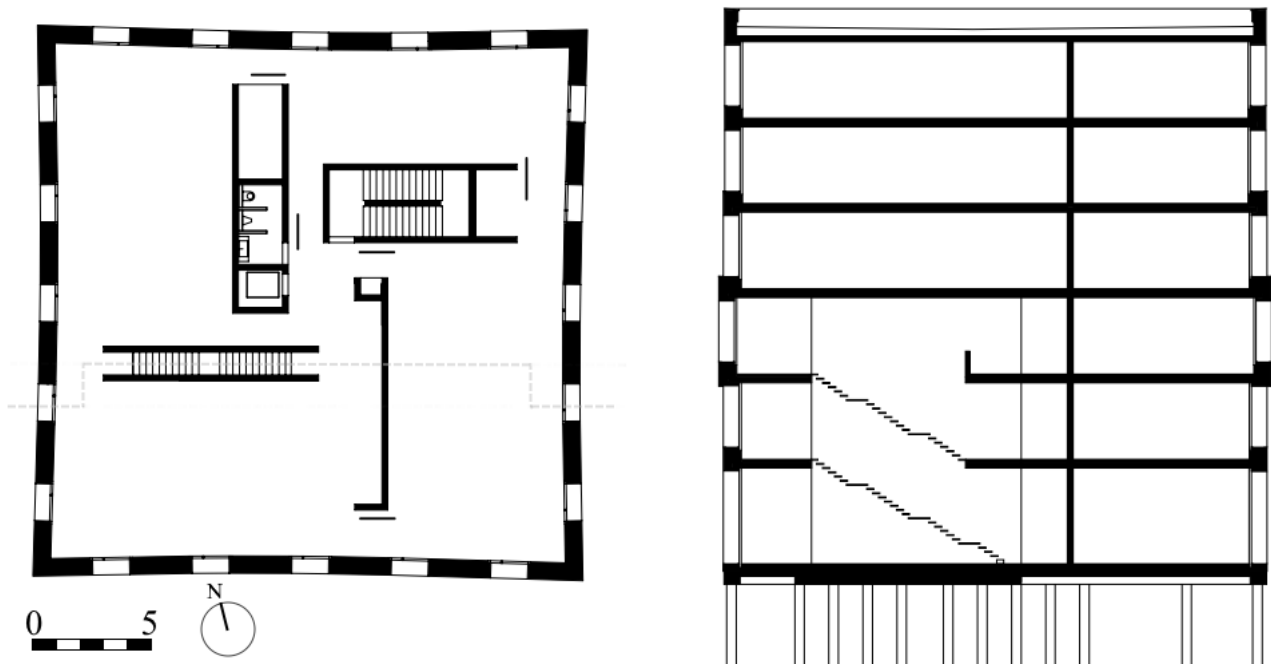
Typical floor plan (left) and vertical section (right) of the 2226 building in Lustenau, Austria. Sourced from (Klein, 2016).
